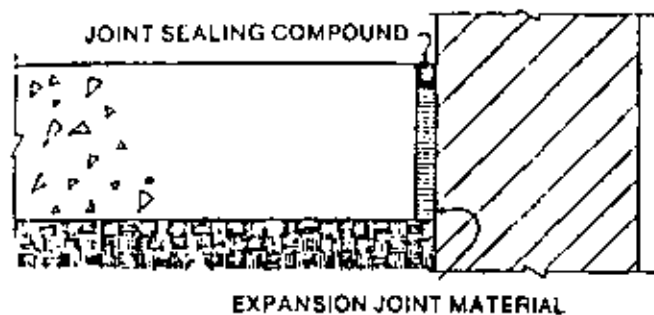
Isolation joints are used between the floor slab and fixed parts of building such as columns and machinery bases.
